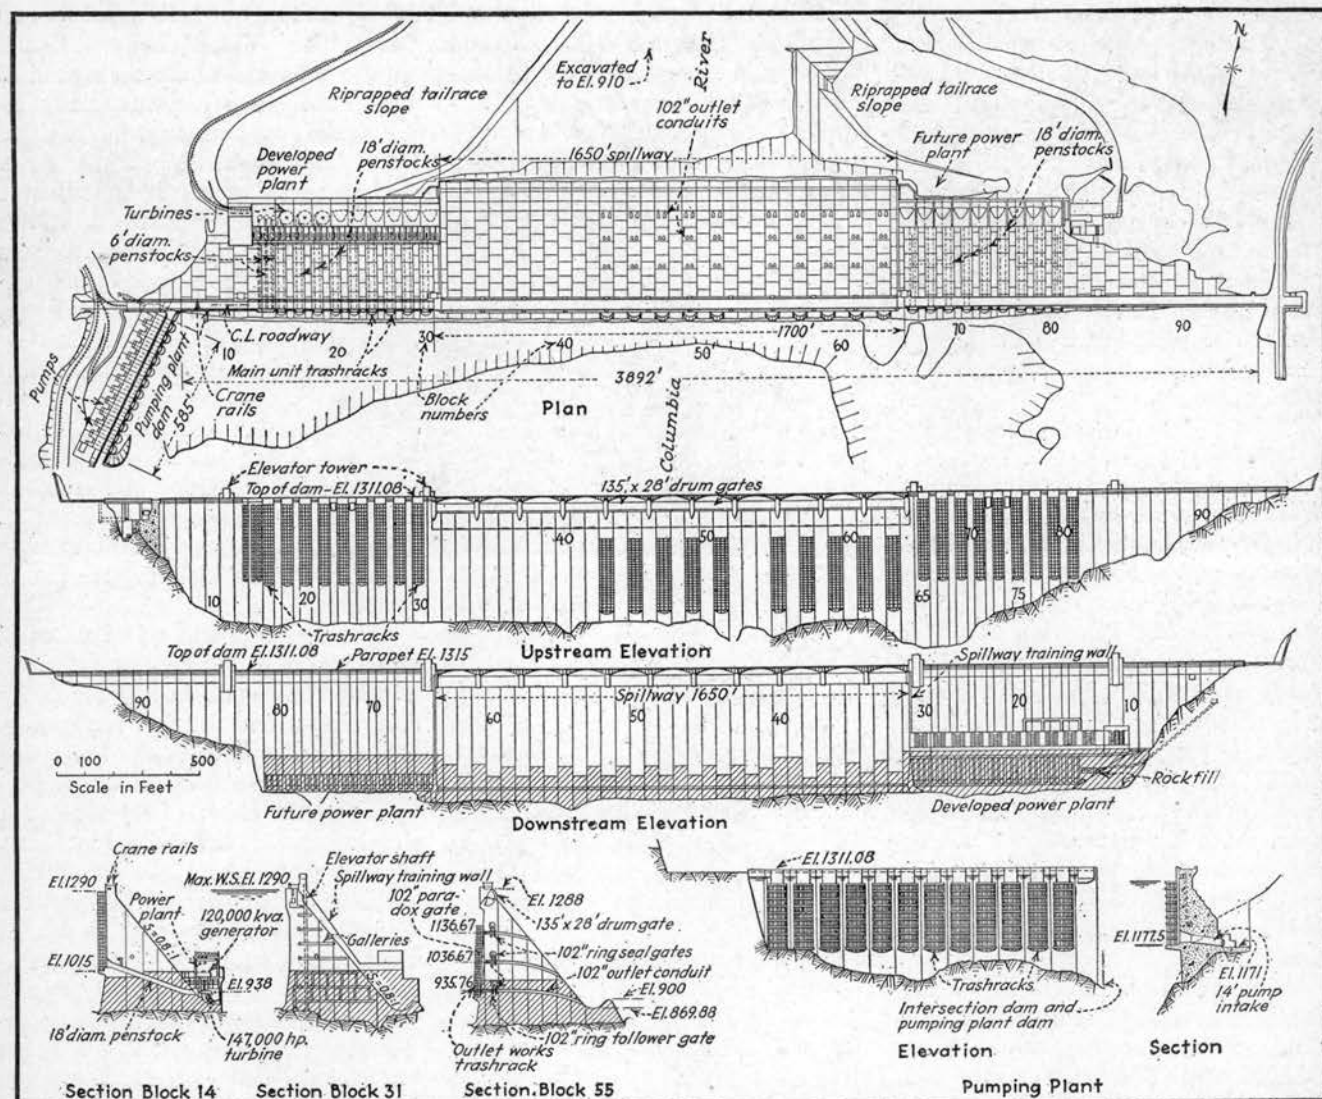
General plans and sections of the high dam at Grand Coulee. The shaded areas of one elevation and three cross-sections represent concrete already placed under previous contract for the base of the dam.
